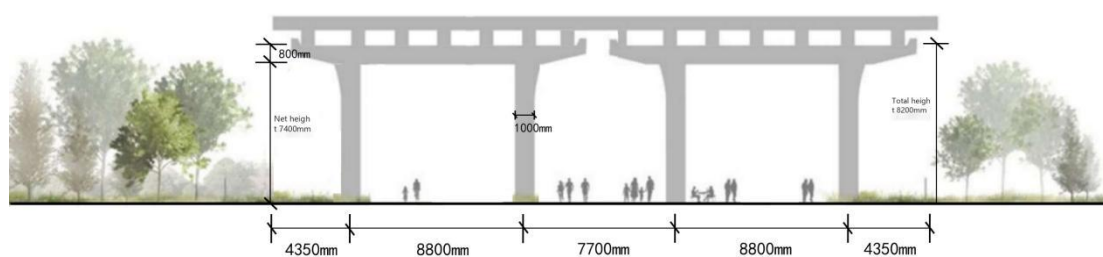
Cross-sectional dimensions of the bridge (taking the bridge at the intersection of Lijiao Street as an example) (Image source: author's own drawing)
